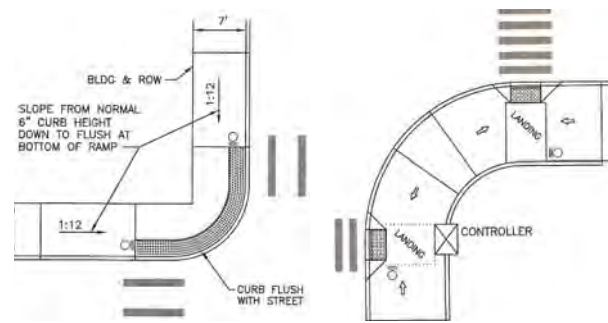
Examples of Sidewalk Ramp Retrofits in Areas with Right-of-Way and Utility Constraints.
